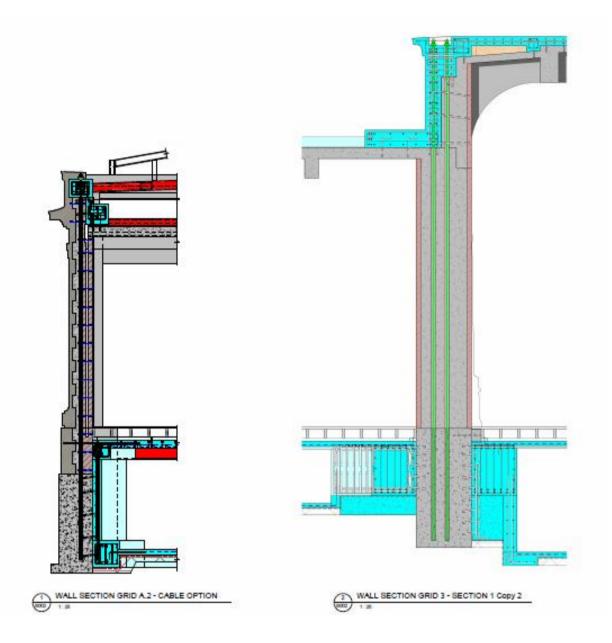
Sectional views of the perimeter and core walls, showing the prestressing and the concrete works
